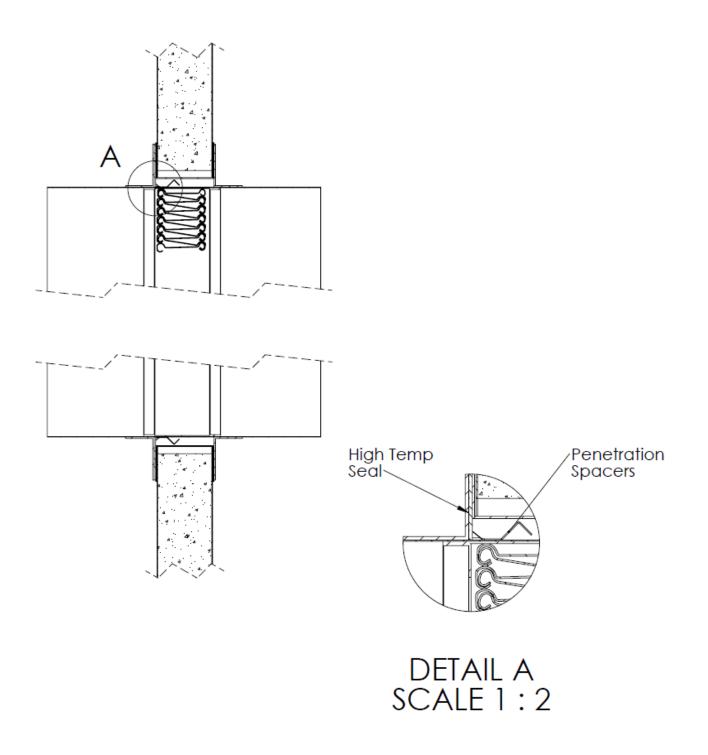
E – Holyoake IBD-FS Fire damper installation with penetration spacers
